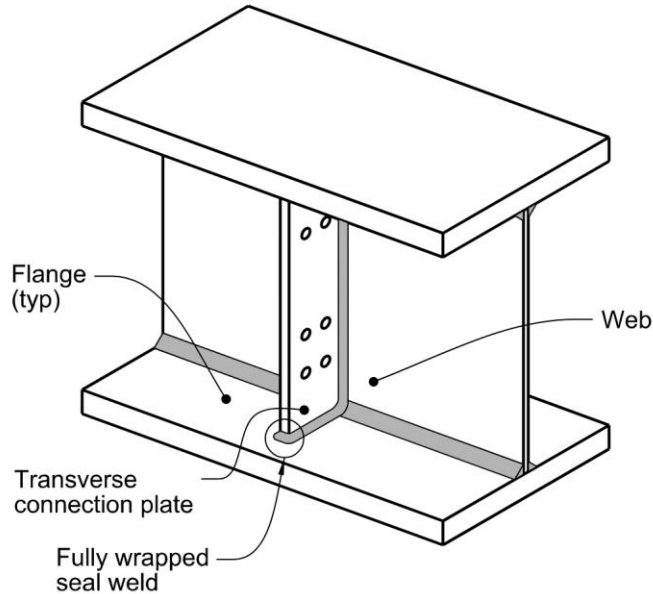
Intersection of a continuously seal-welded transverse connection plate with a girder web and a girder flange.
